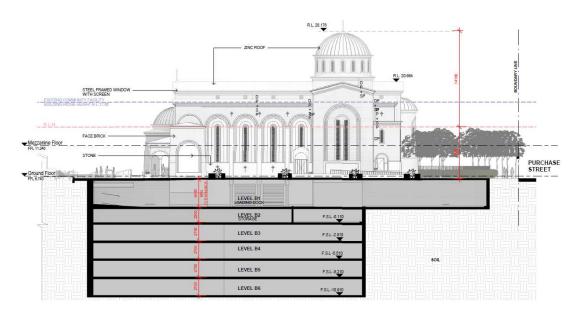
Extract of Eastern Elevation (Purchase Street) showing exceedance in building height. (Amended Plans)
